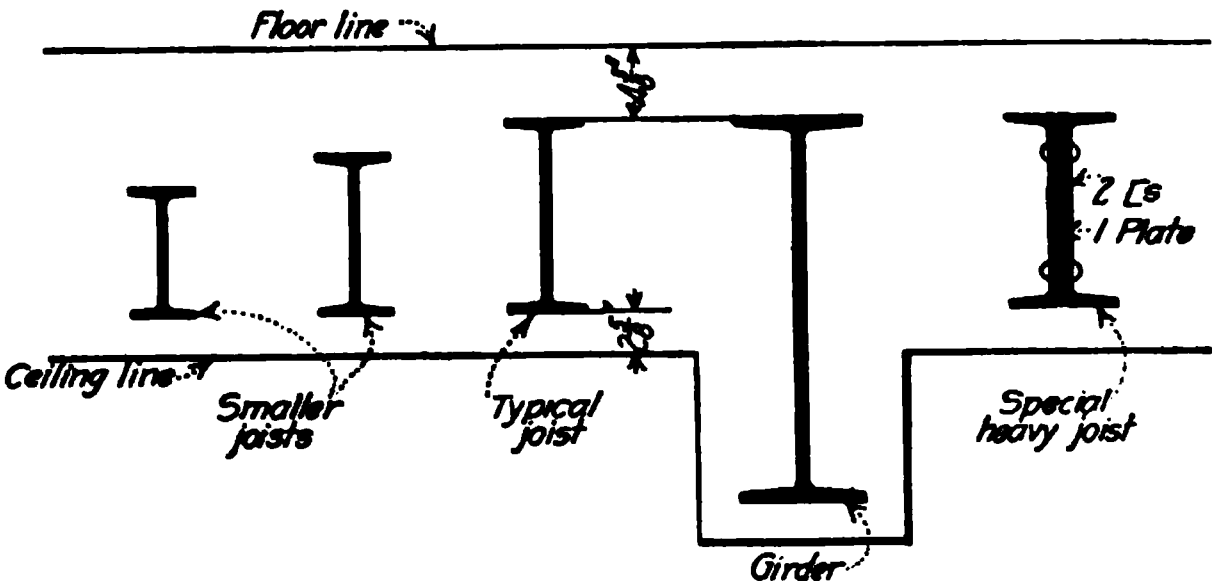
Diagram showing the relative position of joists and girder in tile arch floor.
